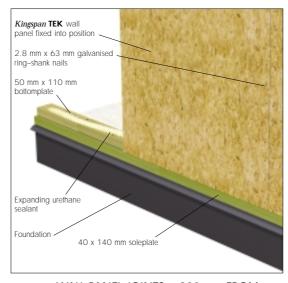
WALL PANEL JOINTS > 300 mm FROM JOINTS IN BOTTOMPLATES
